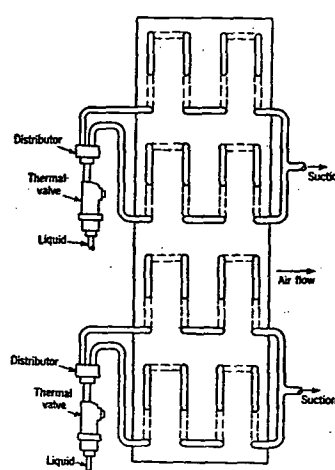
ARRANGEMENT FOR FACE CONTROL
